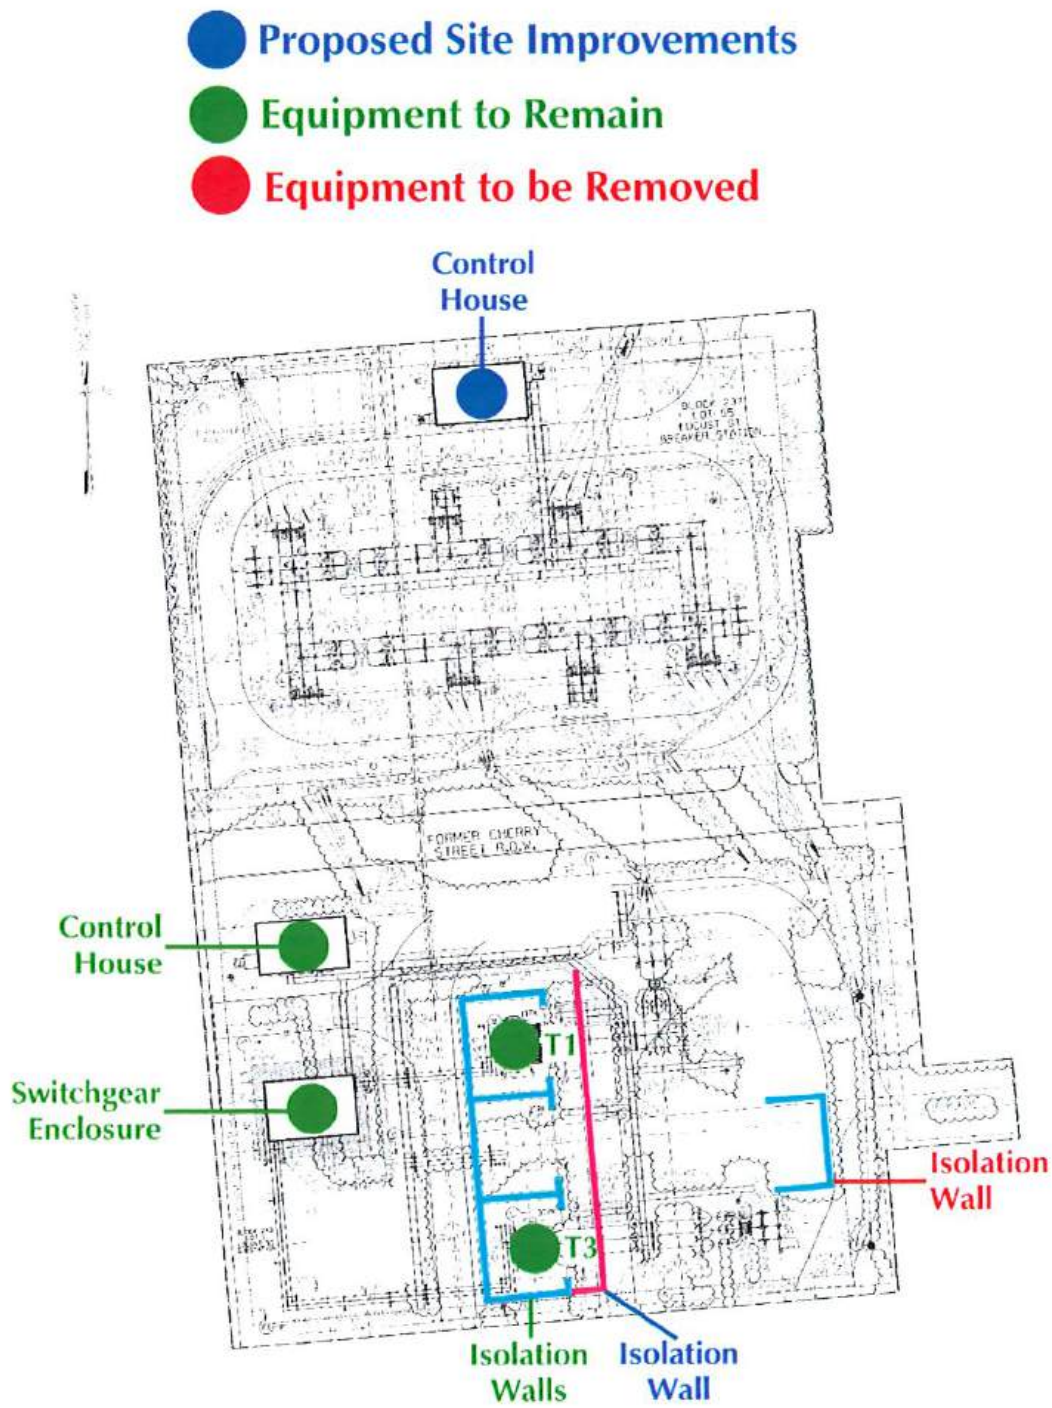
PSE&G Locust Street Substation, Camden, NJ showing major equipment and systems to be added in blue, equipment to be removed in red, and equipment to remain in green. Existing isolation walls shown in light blue; future isolation wall shown in pink.
